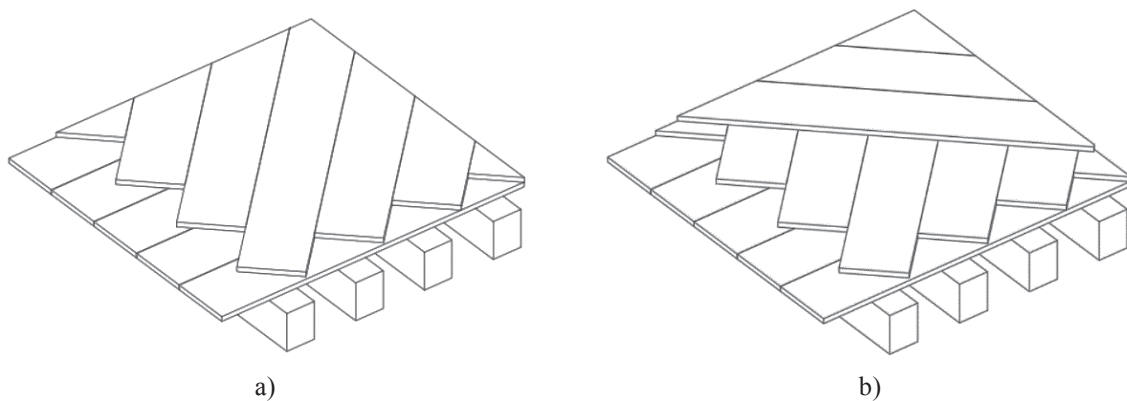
Reinforced timber floor with single planking inclined at  $45^\circ$  (a); reinforced timber floor with double planking crossed at  $+45^\circ$  and  $-45^\circ$  (b).
